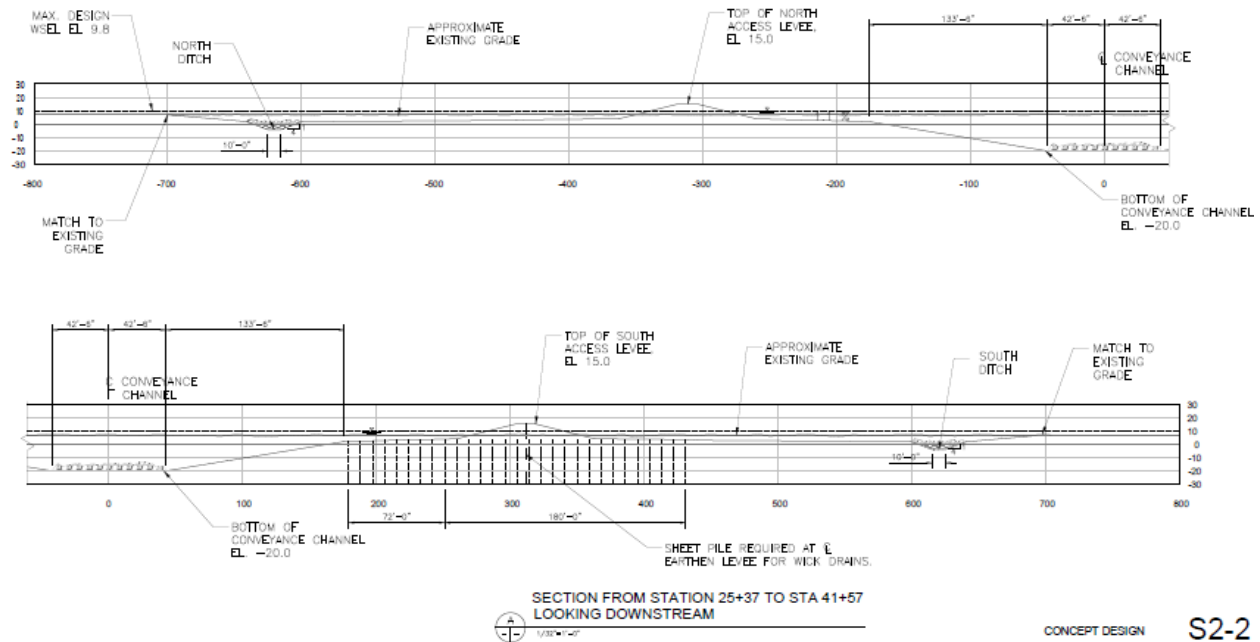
Alt. B – Typical Cross-Sectional View of the Conveyance Channel
